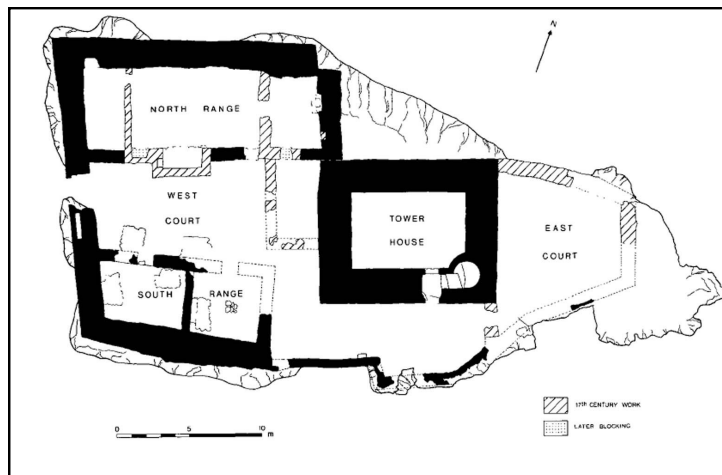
Plan of Smailholm Tower. The trench the flint and bead came from was located outside the barmkin, to the north of the Tower House (after Good and Tabraham 1988: Illus 19).
